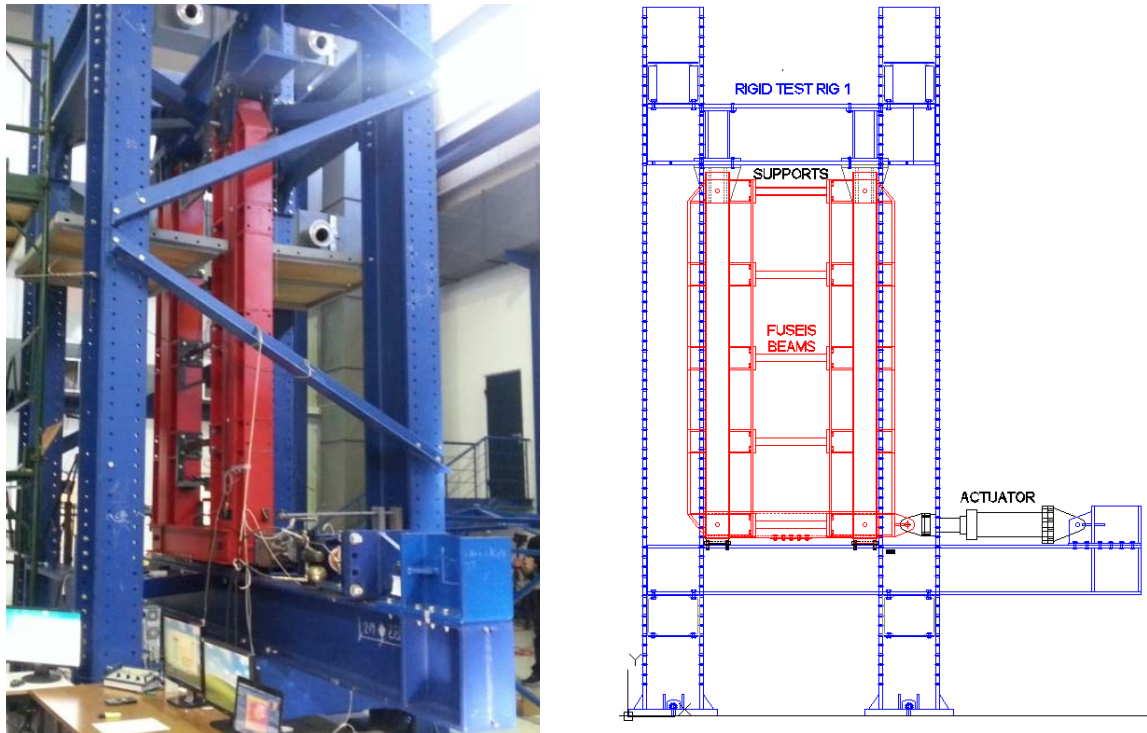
General layout of test setup for FUSEIS with beams (a) photo (b) drawing
